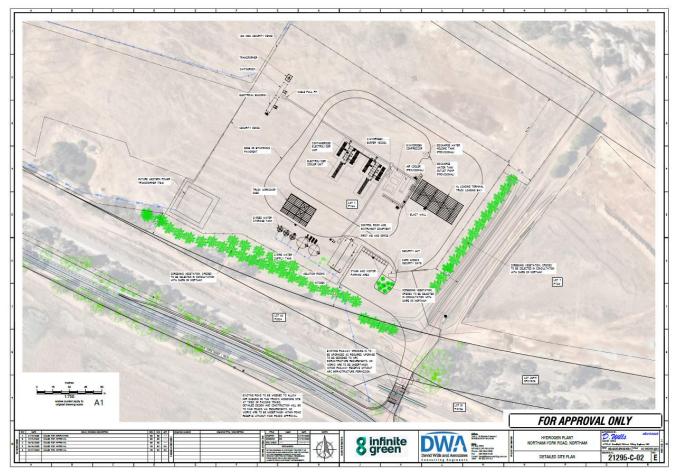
Detailed Site Plan - Lot boundaries, North Point and vegetation screening
